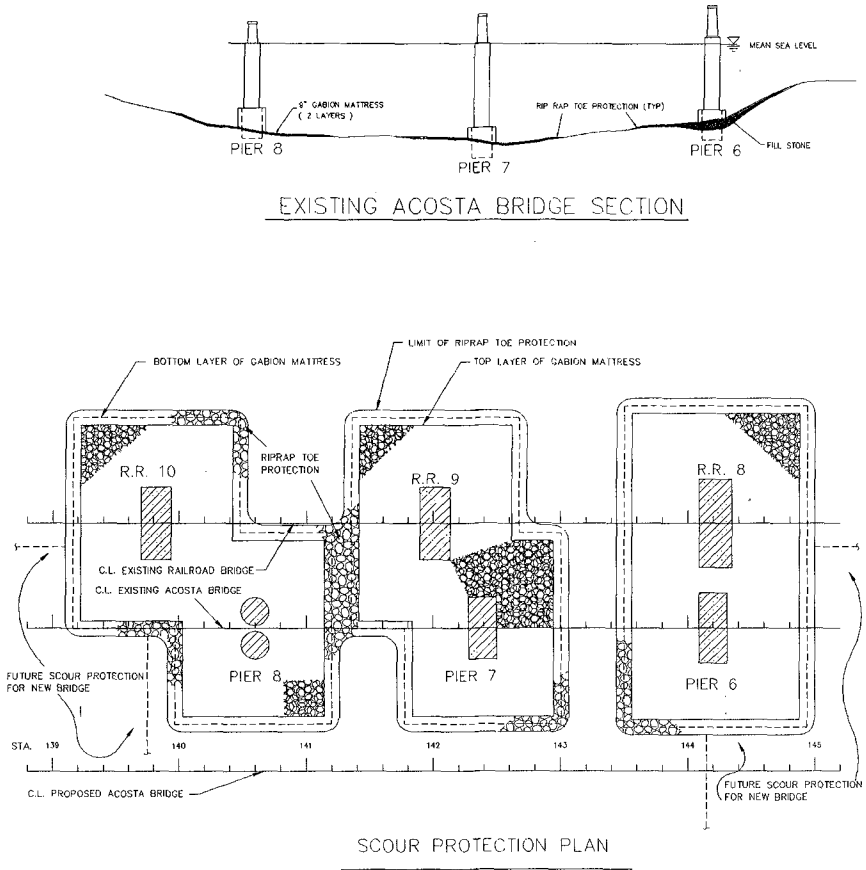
Plan of Scour Protection for Existing Acosta and Railroad Bridges
